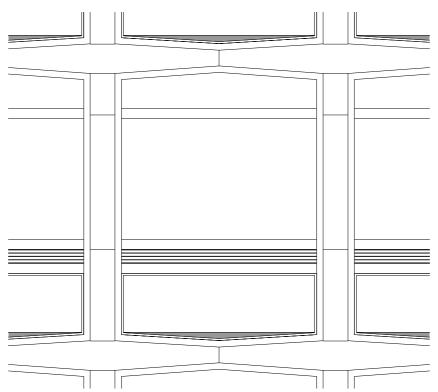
Proposed Kingsway Fixed Window Unit
